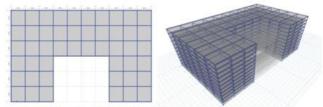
Model3:Building withRibbed Slab: Plan &3Dmodel
